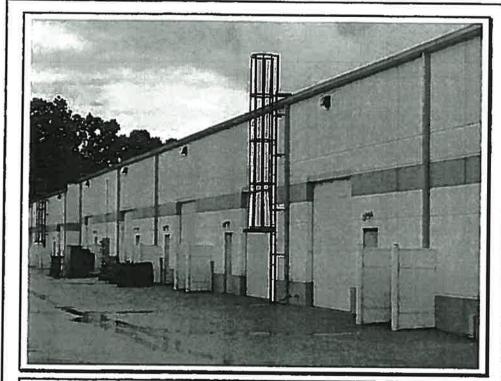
PROPERTY View South Elevations, 17750-17851 Bretz Drive
